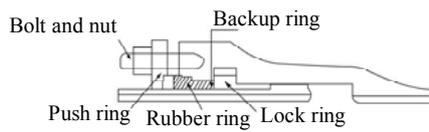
Examples of hard PVC pipe expansion joints
